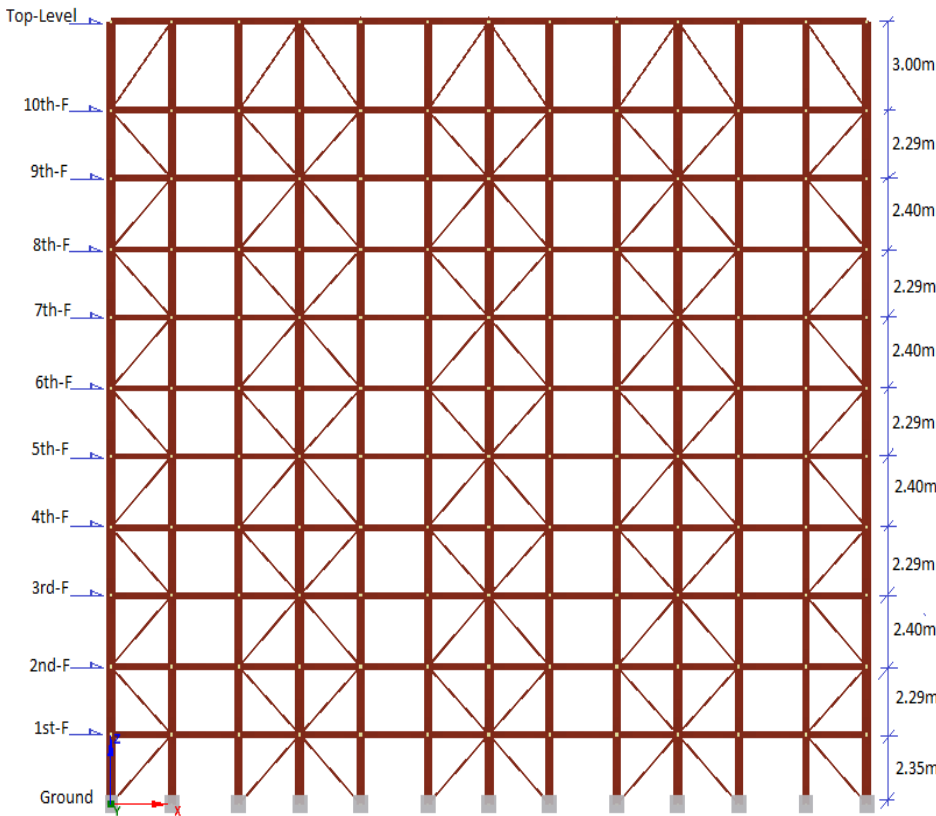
Front Elevation View (Axes A-A and B-B) of 10-Storey frame [12]
